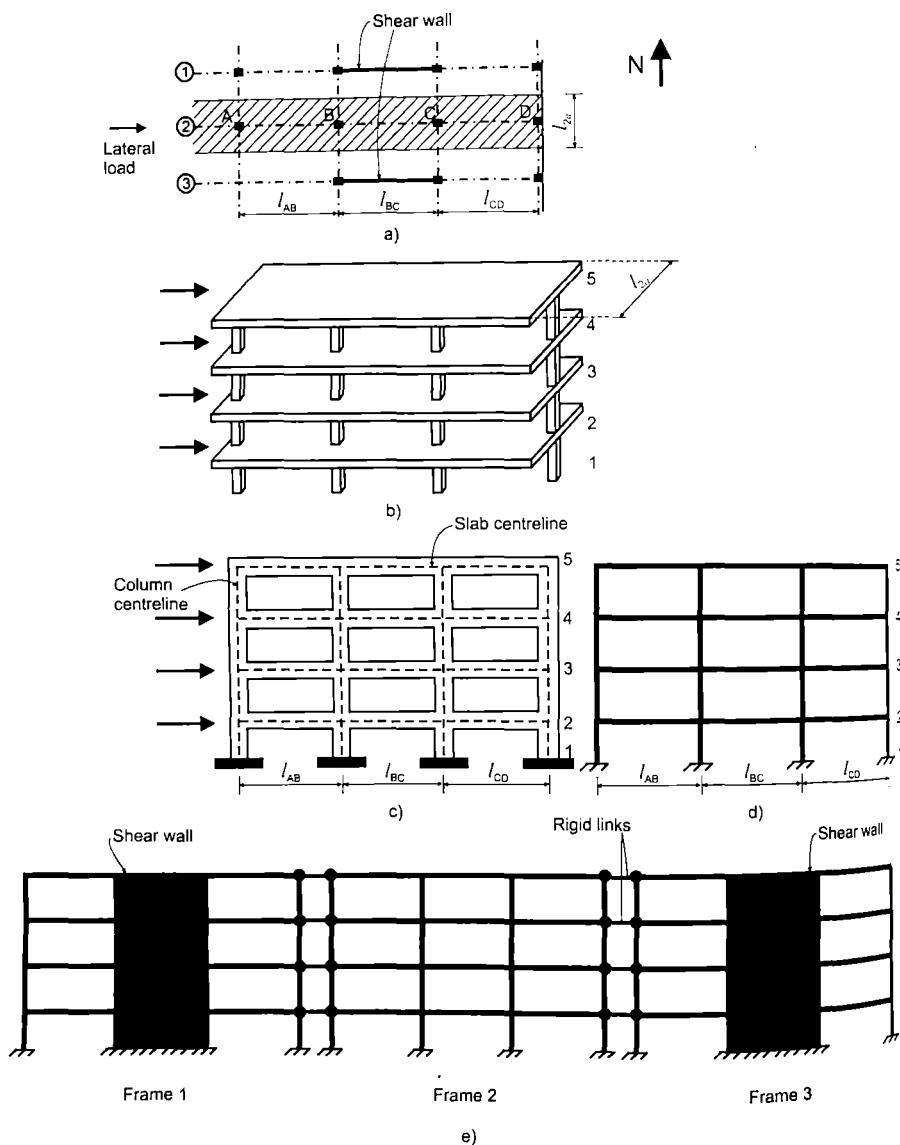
Frame models for lateral load analysis of two-way slabs: a) a typical building plan; b) an isometric view of a 2-D frame model; c) a 2-D frame showing actual column and slab dimensions; d) a 2-D model used for the lateral load analysis; and e) a linked frame model for lateral load analysis.
